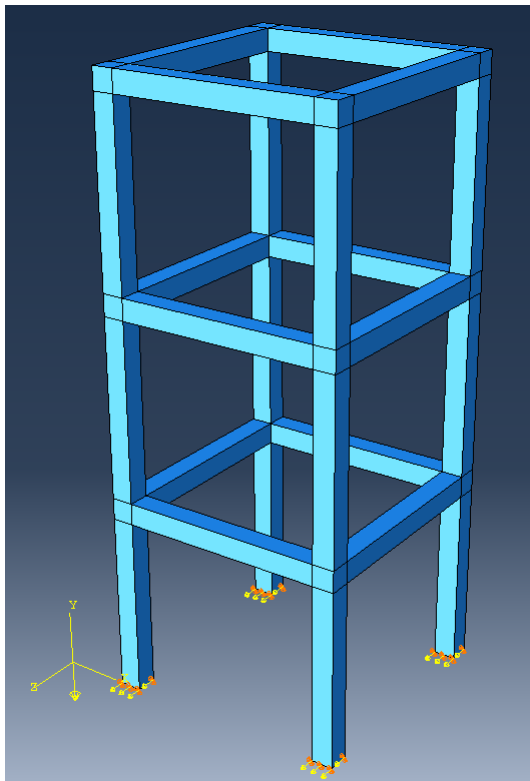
Multi-storey reinforced concrete structure [Abaqus]
